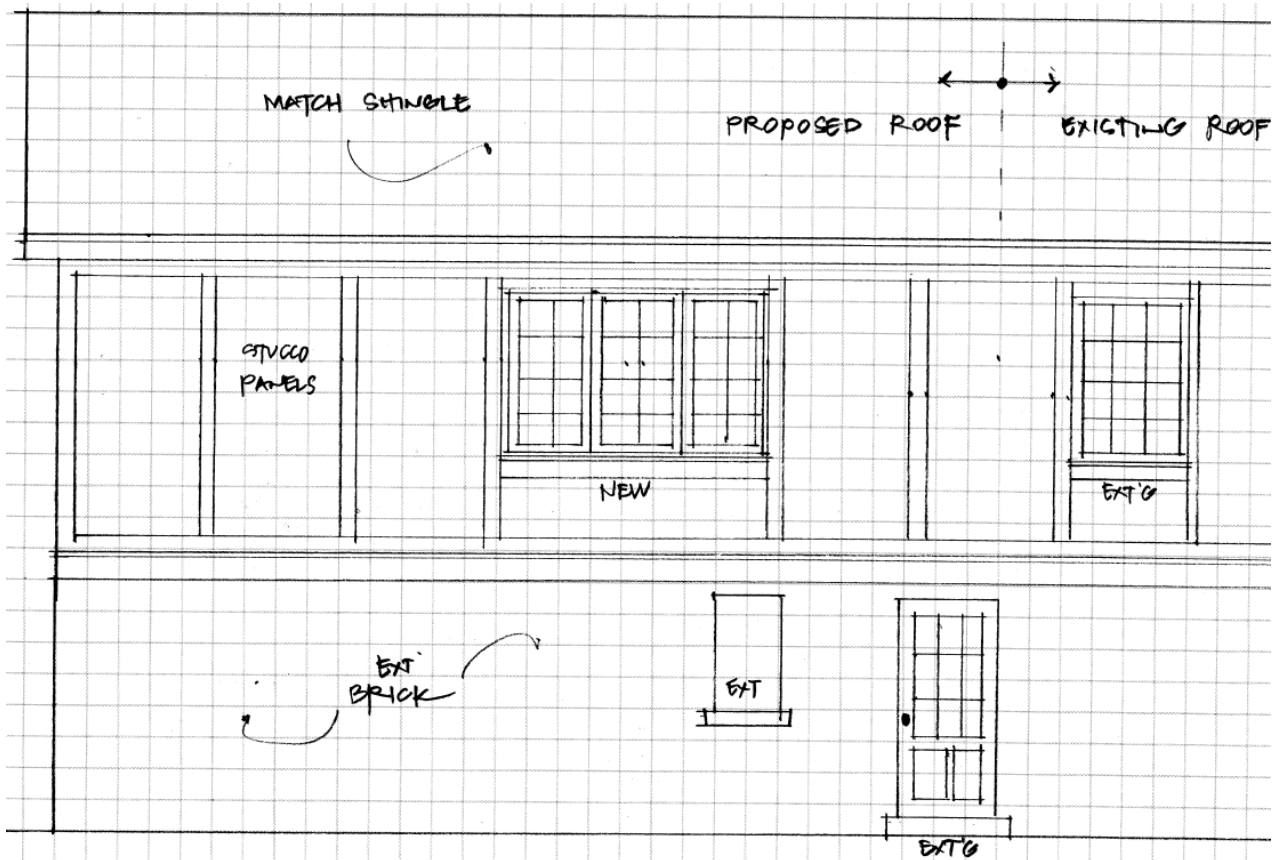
Previous south elevation of proposed second-floor addition (October Meeting)
